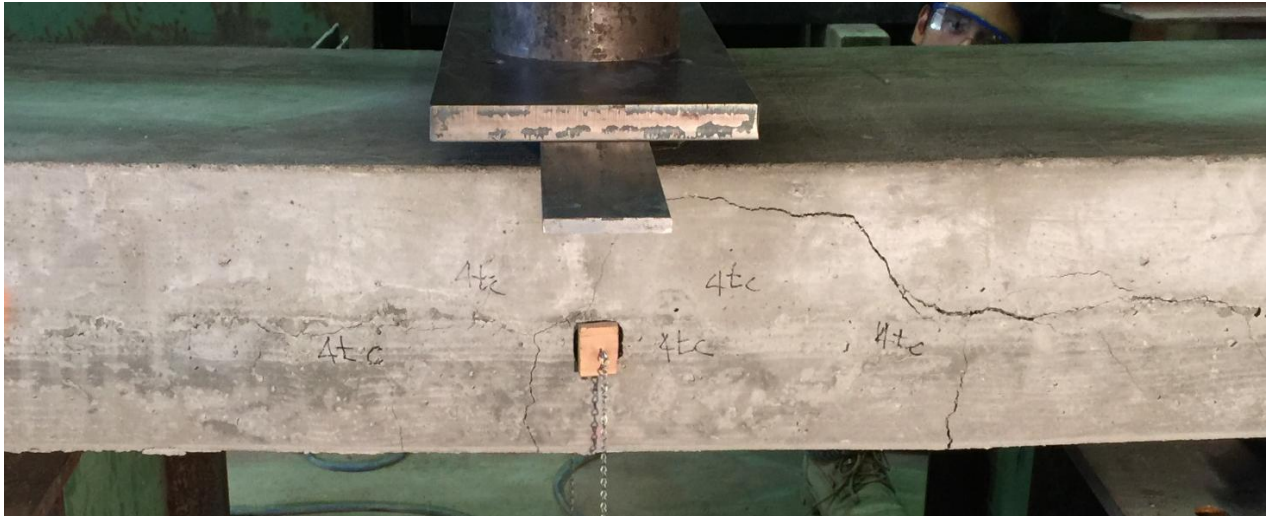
Case 4 negative bending flexural test specimen failure at concrete bond interface
